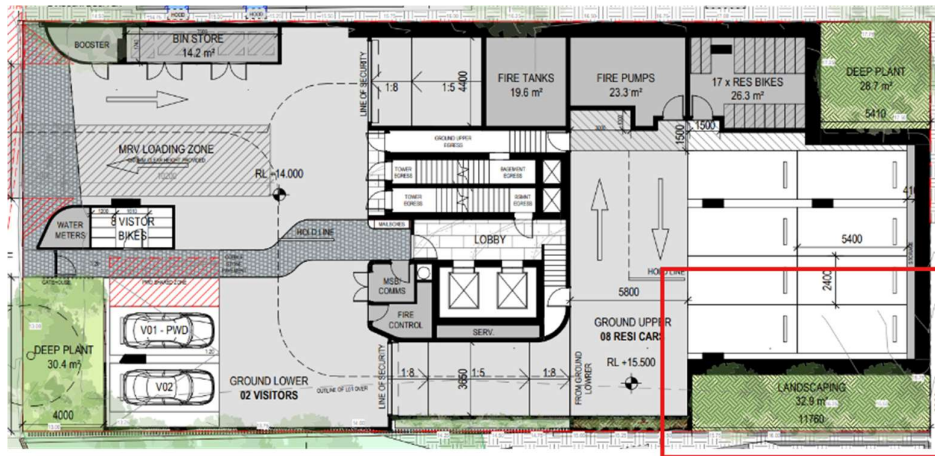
Revised ground level car parking arrangement (Source: Plus Studio, 2026)
